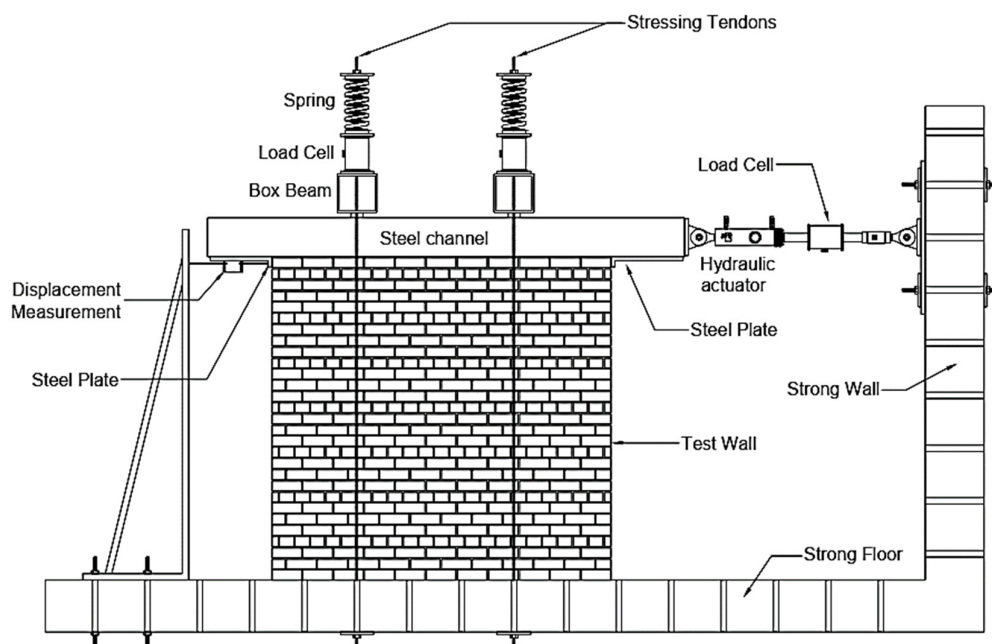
In-plane test setup for URM wall (Russel and Ingham 2010).
